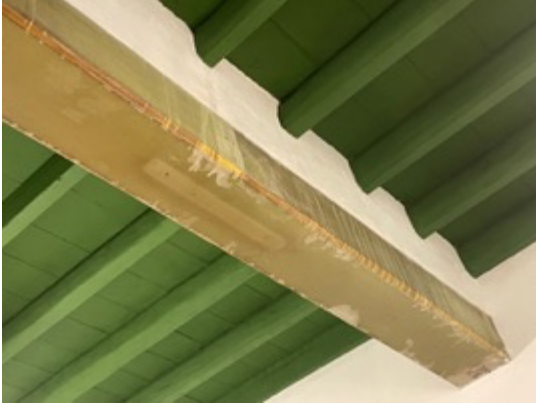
Efflorescence on Roofing Beam (Source: The Author's Collection)
